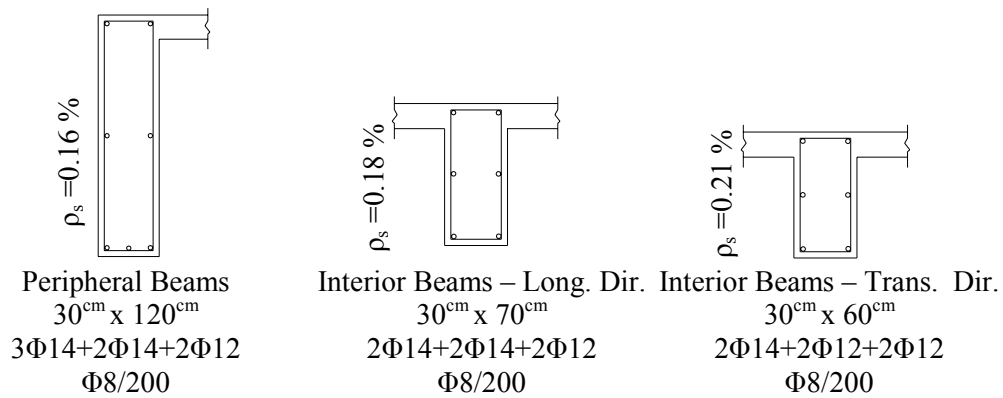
Cross-section dimensions, longitudinal and transverse reinforcement of the (a) peripheral beams, (b) interior beams in the longitudinal direction and (c) interior beams in the transverse direction of the building
